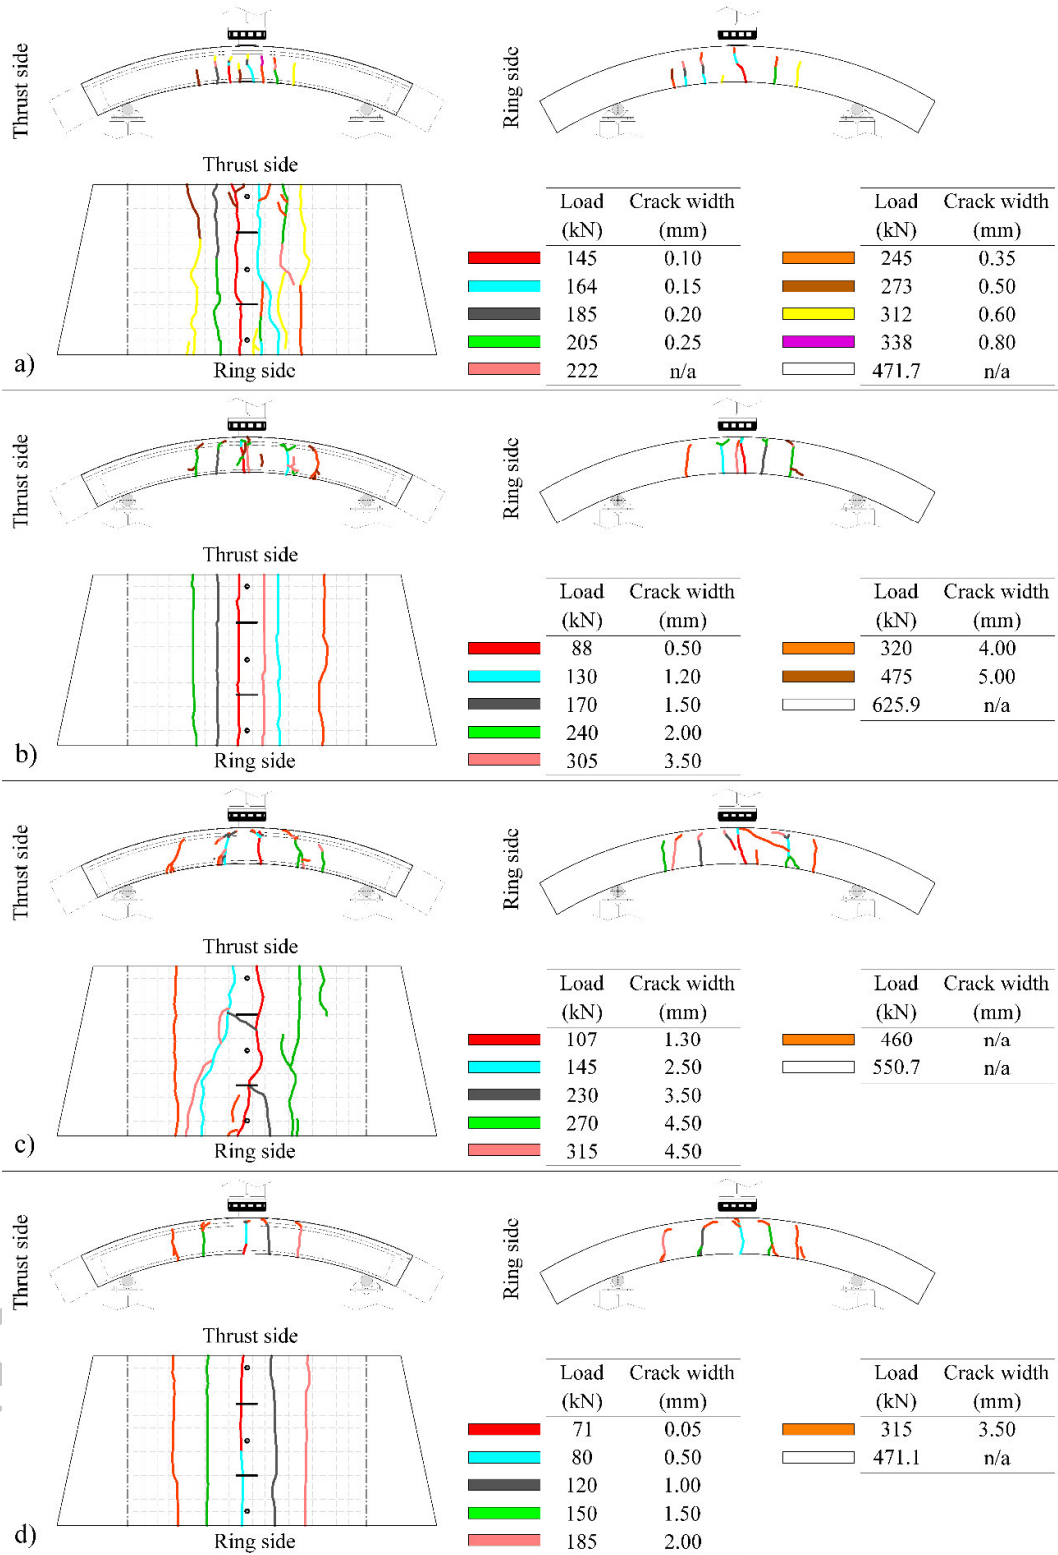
Bending test results: crack pattern. a) SR; b) GFRP-RR; c) GFRP-LR; and d)
